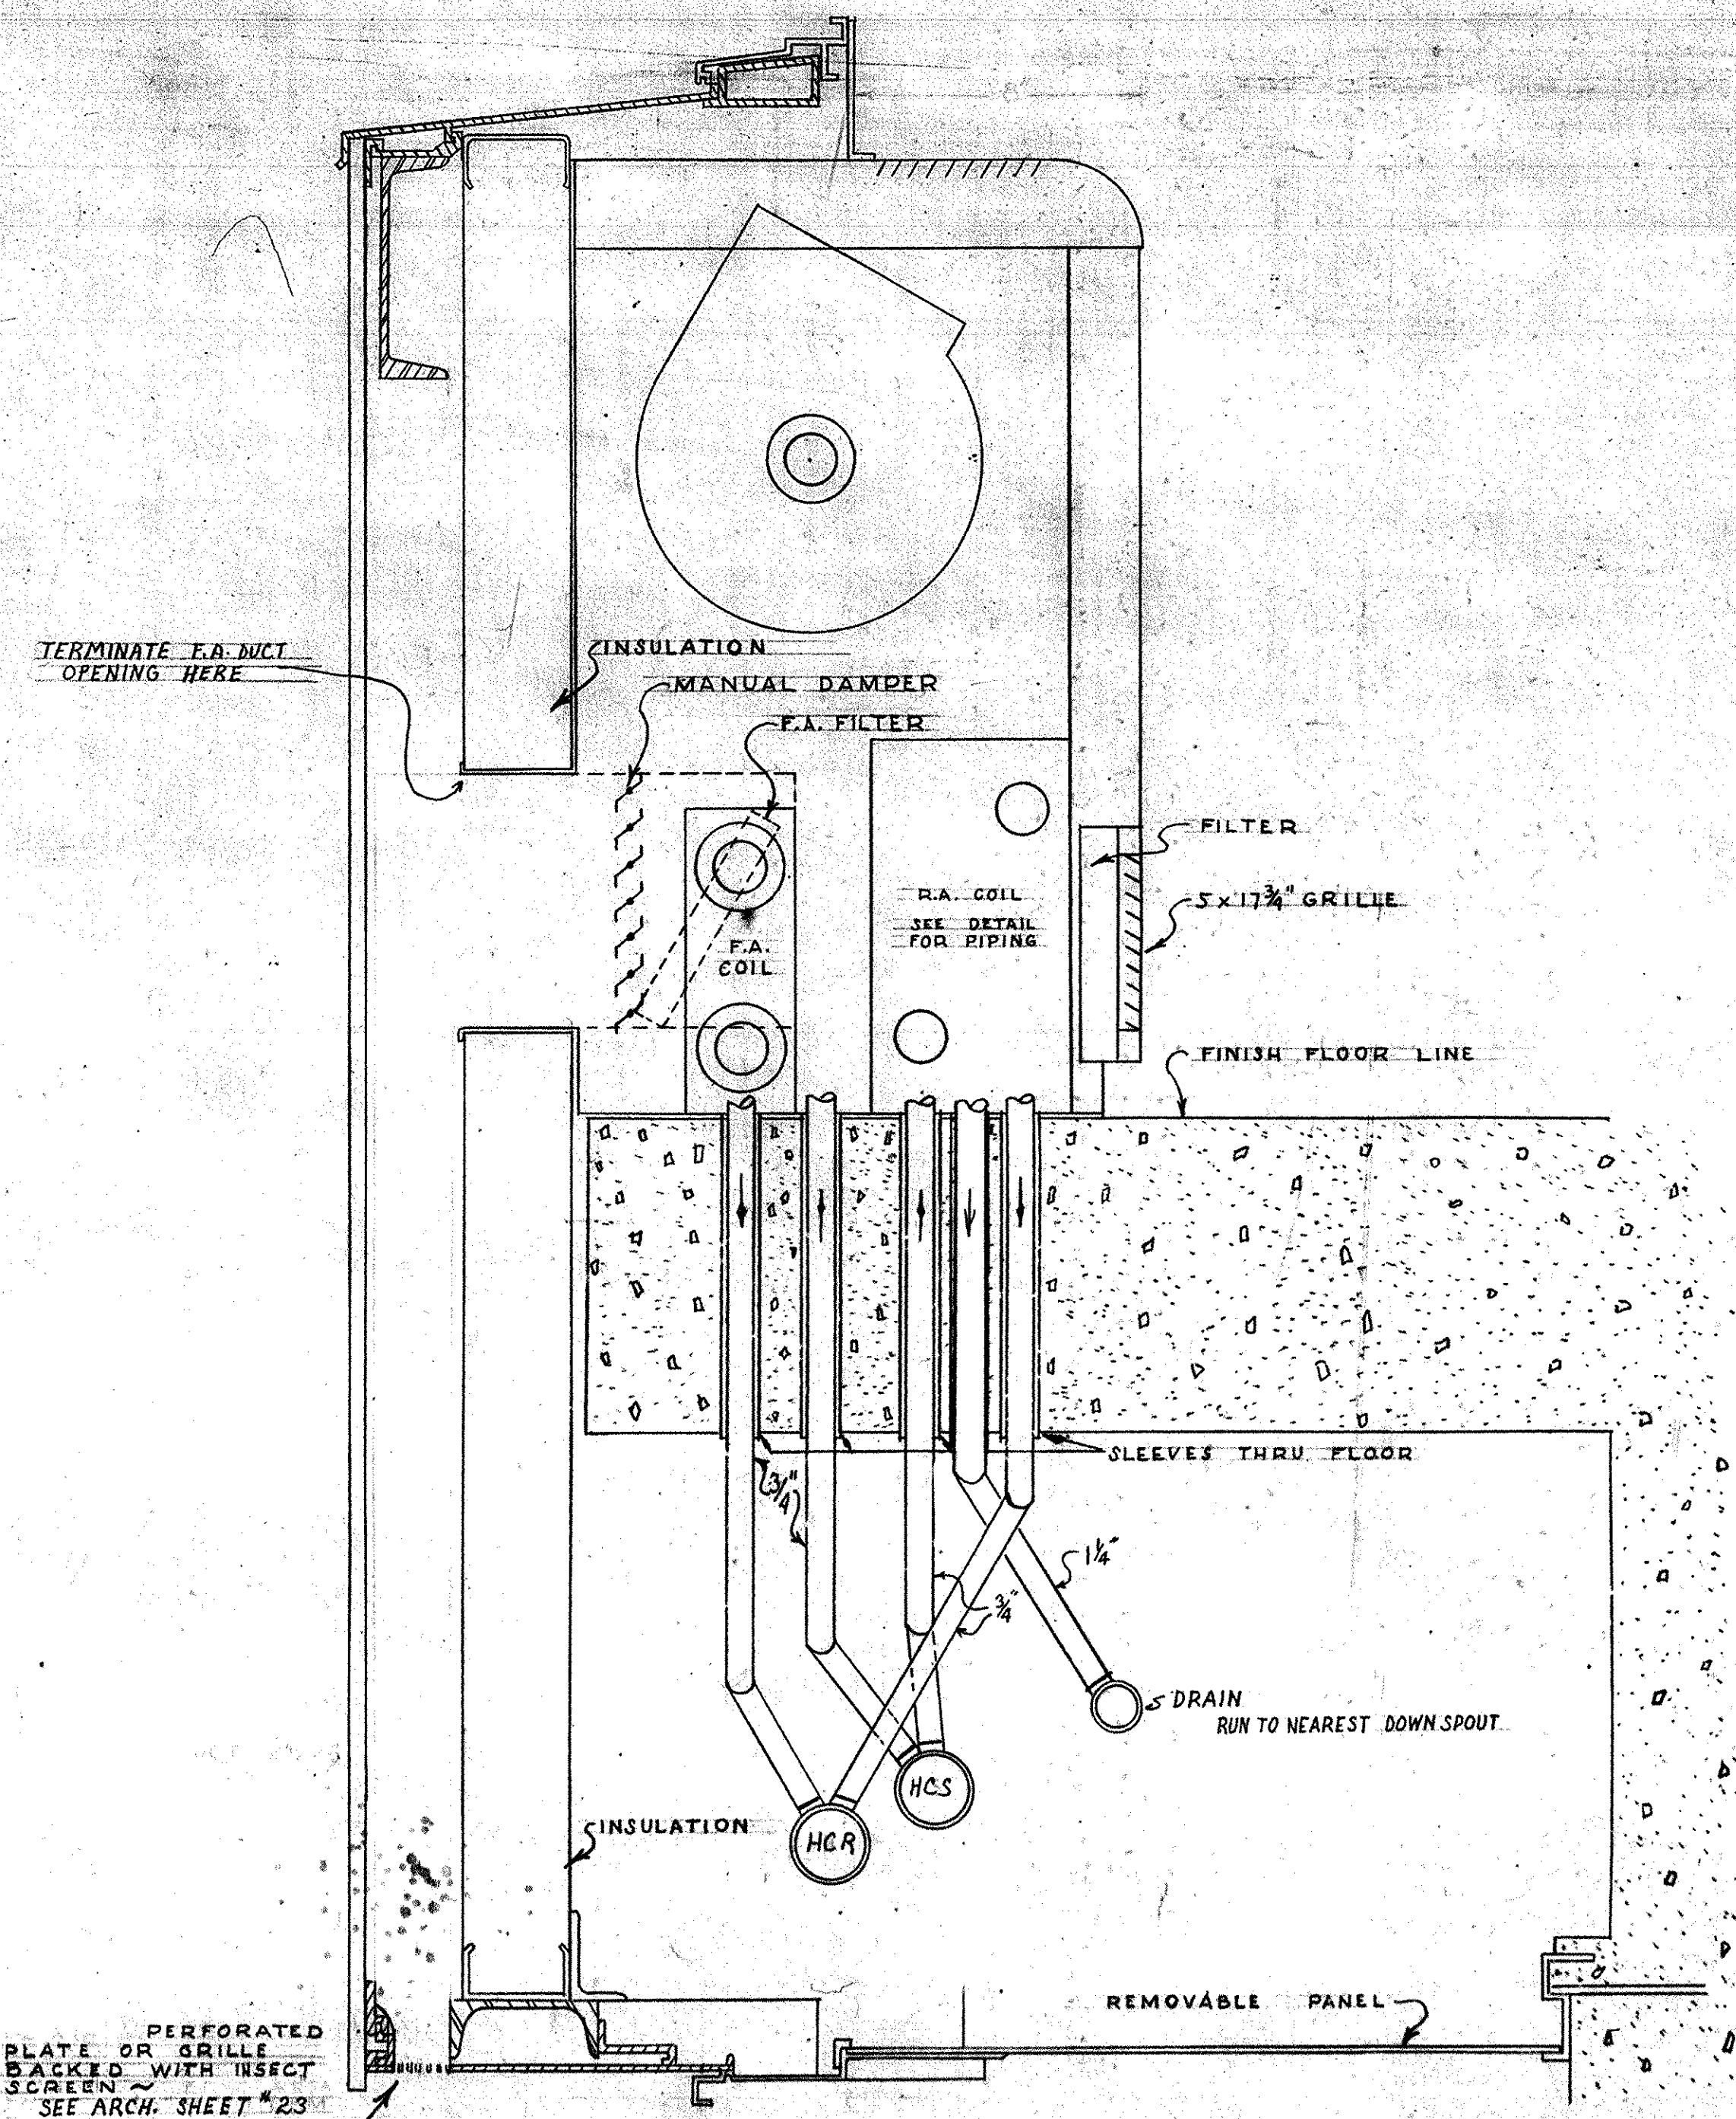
DETAIL OF CONNECTIONS TO RISERS NO. 4-5-6-7 ON TYPICAL FLOORS. OTHER RISERS SIMILAR. NO SCALE
